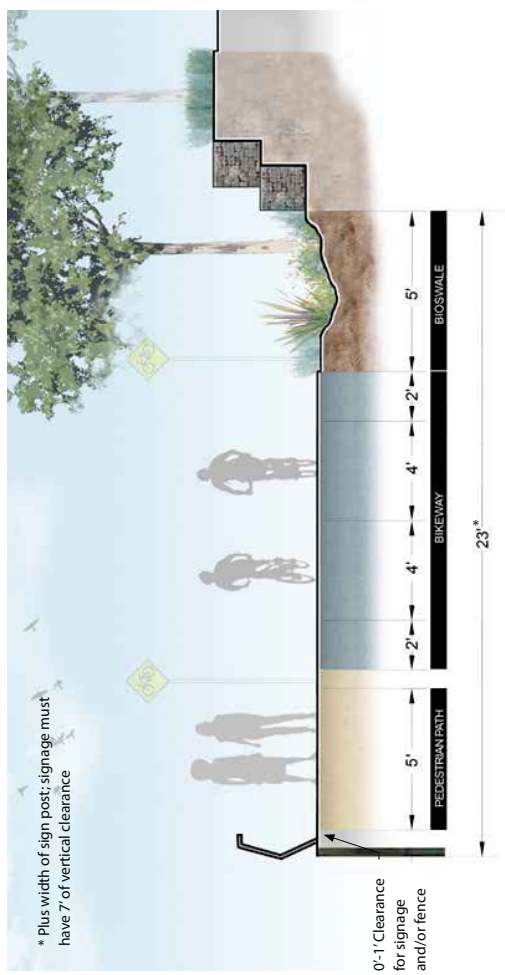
Fulton Avenue to Coldwater Canyon - Typical Cross Section
